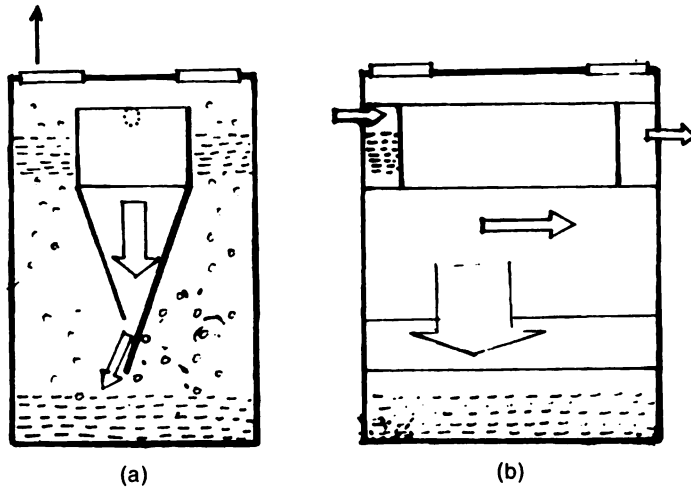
Principle of Imhoff tank: (a) Cross section, (b) Longitudinal section.
